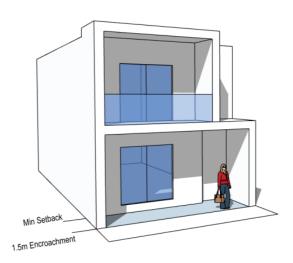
Typical balcony design when Standard 7 isn't applied to balcony offset.
